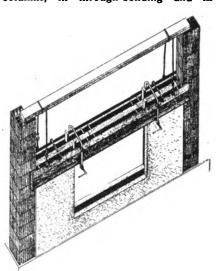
Isometric View Showing the Arrangement of Double Wall Forms and Supporting Columns
